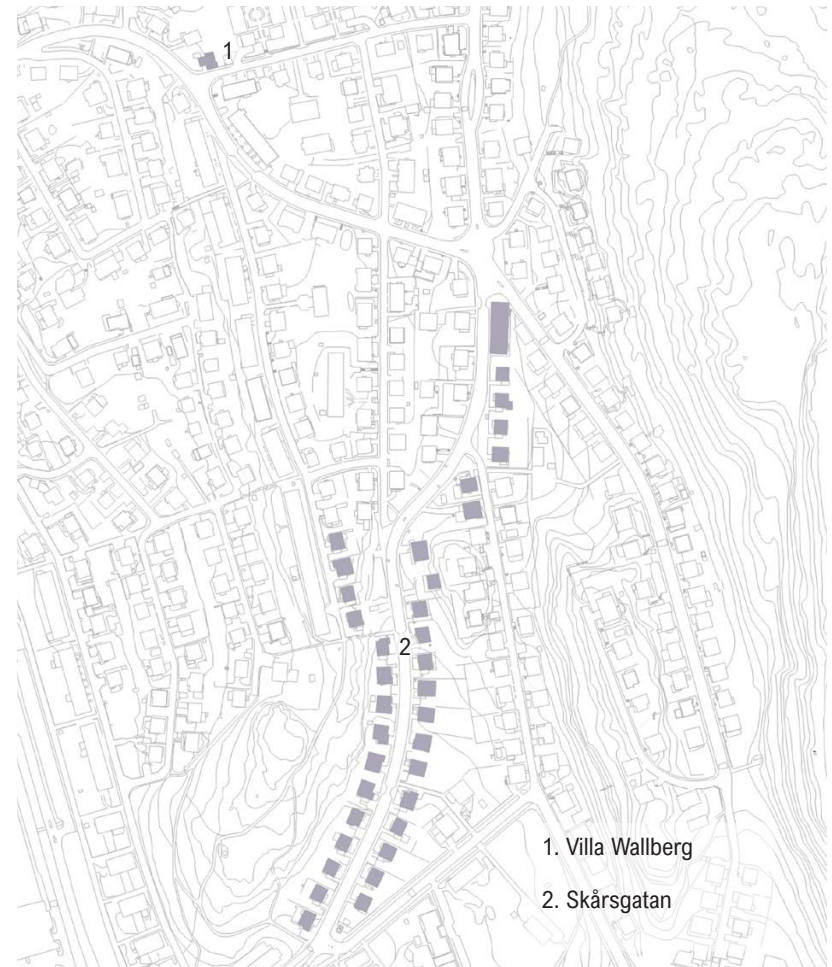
Situation plan of Villa Walberg and the street Skårsgatan
